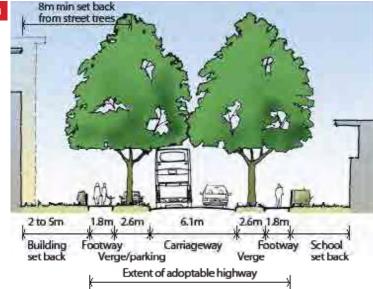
Section through Primary Road - Spine Road Northern School Avenue
